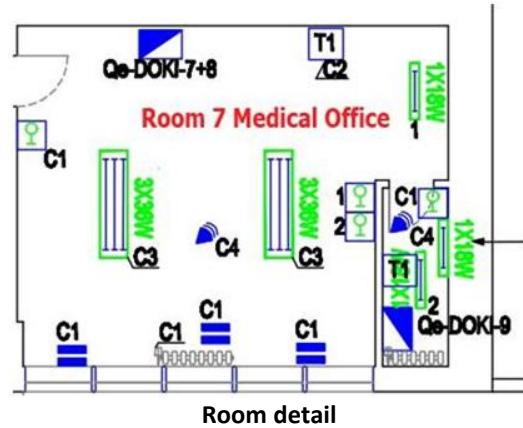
Genoa School: 1st floor Rooms and existing provisions
